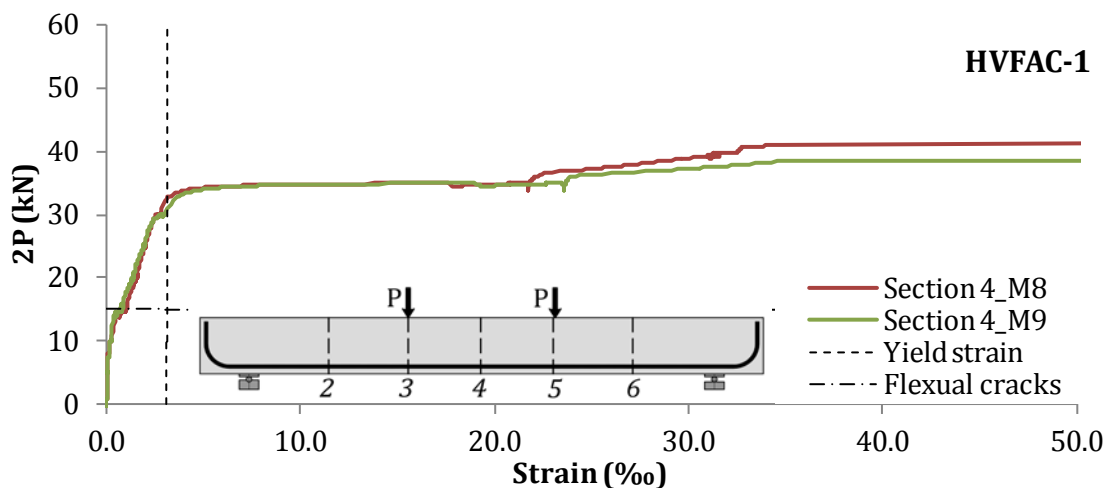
Longitudinal reinforcement strains in the HVFAC-1 beam in section 4
